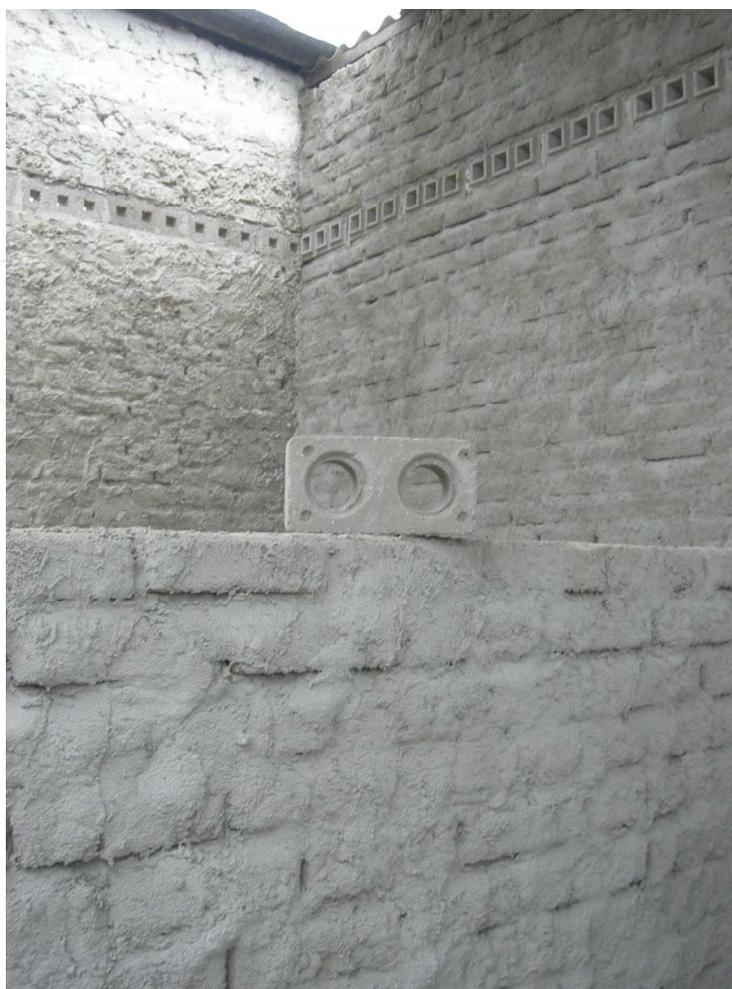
Soil-lime brick containing granite sawing waste and a construction developed using this kind of brick.
